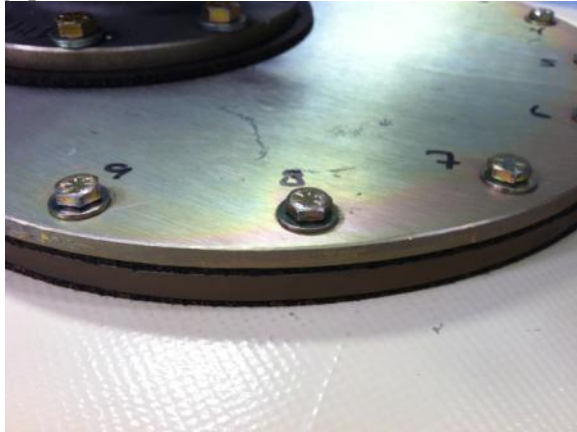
Bolts 7-9 with leaks coming out of bolt-holes and from under the cork gasket
